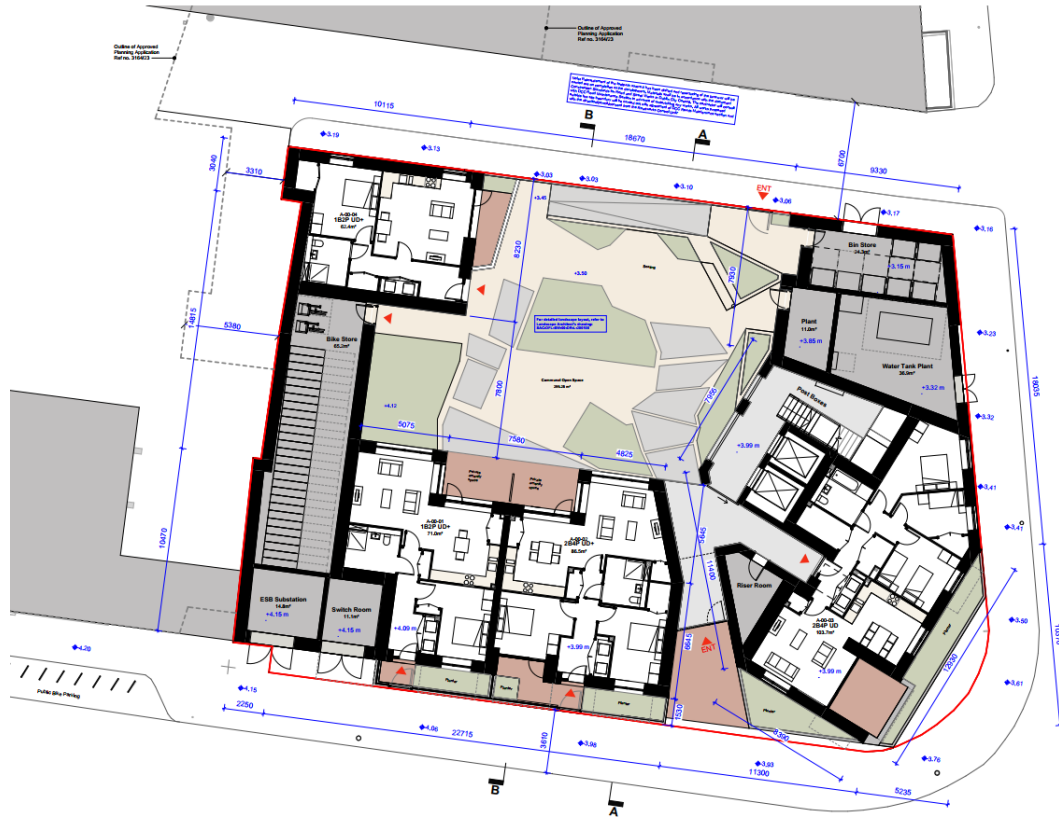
Proposed Development Layout- Ground Floor (O'Donnell Tuomey)
